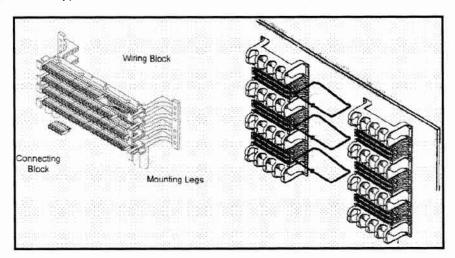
110-Type Wiring Blocks & Cable Management Blocks
